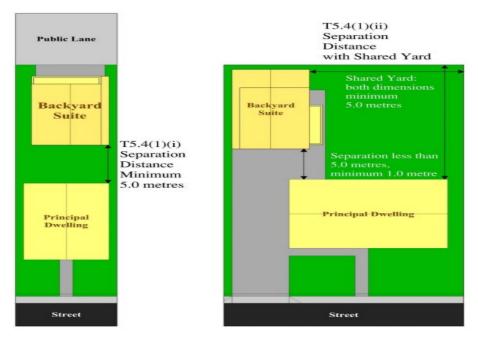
D.F2A: SETBACK FROM PRIMARY BUILDING FOR DWELLING, BACKYARD SUITE (#2022-41, s. 24, 2022)
